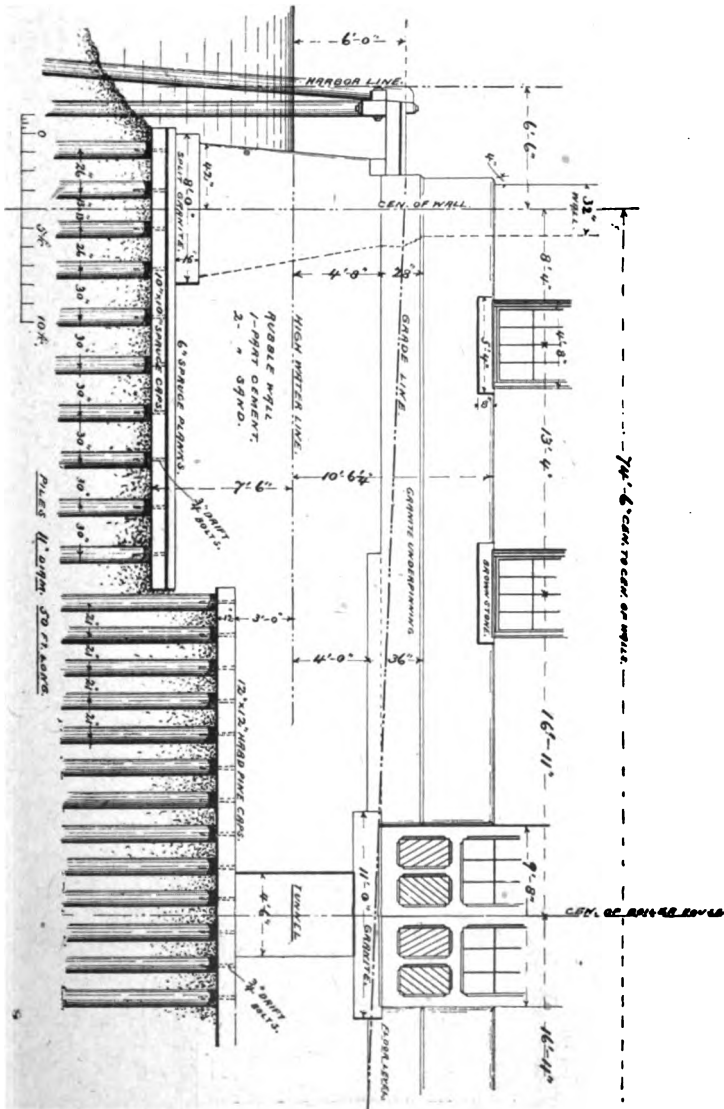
N. W. CORNER OF BOILER HOUSE WALL.
